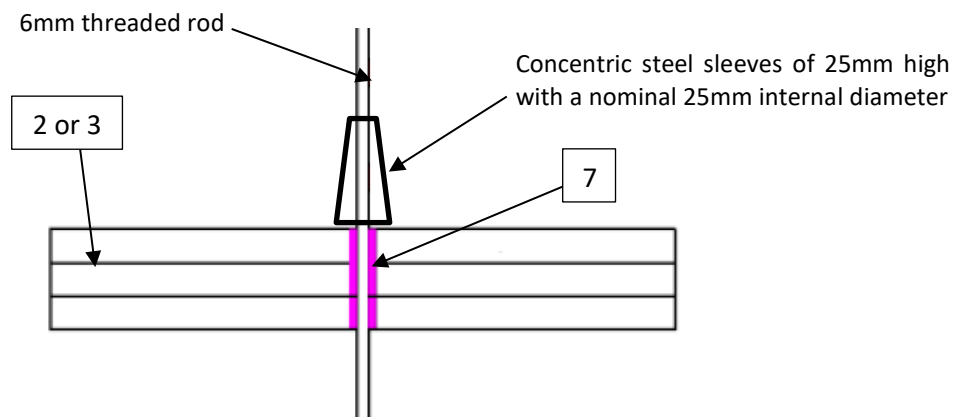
Additional sealant and steel sleeves protection for floor-ceiling system with a false ceiling beneath
